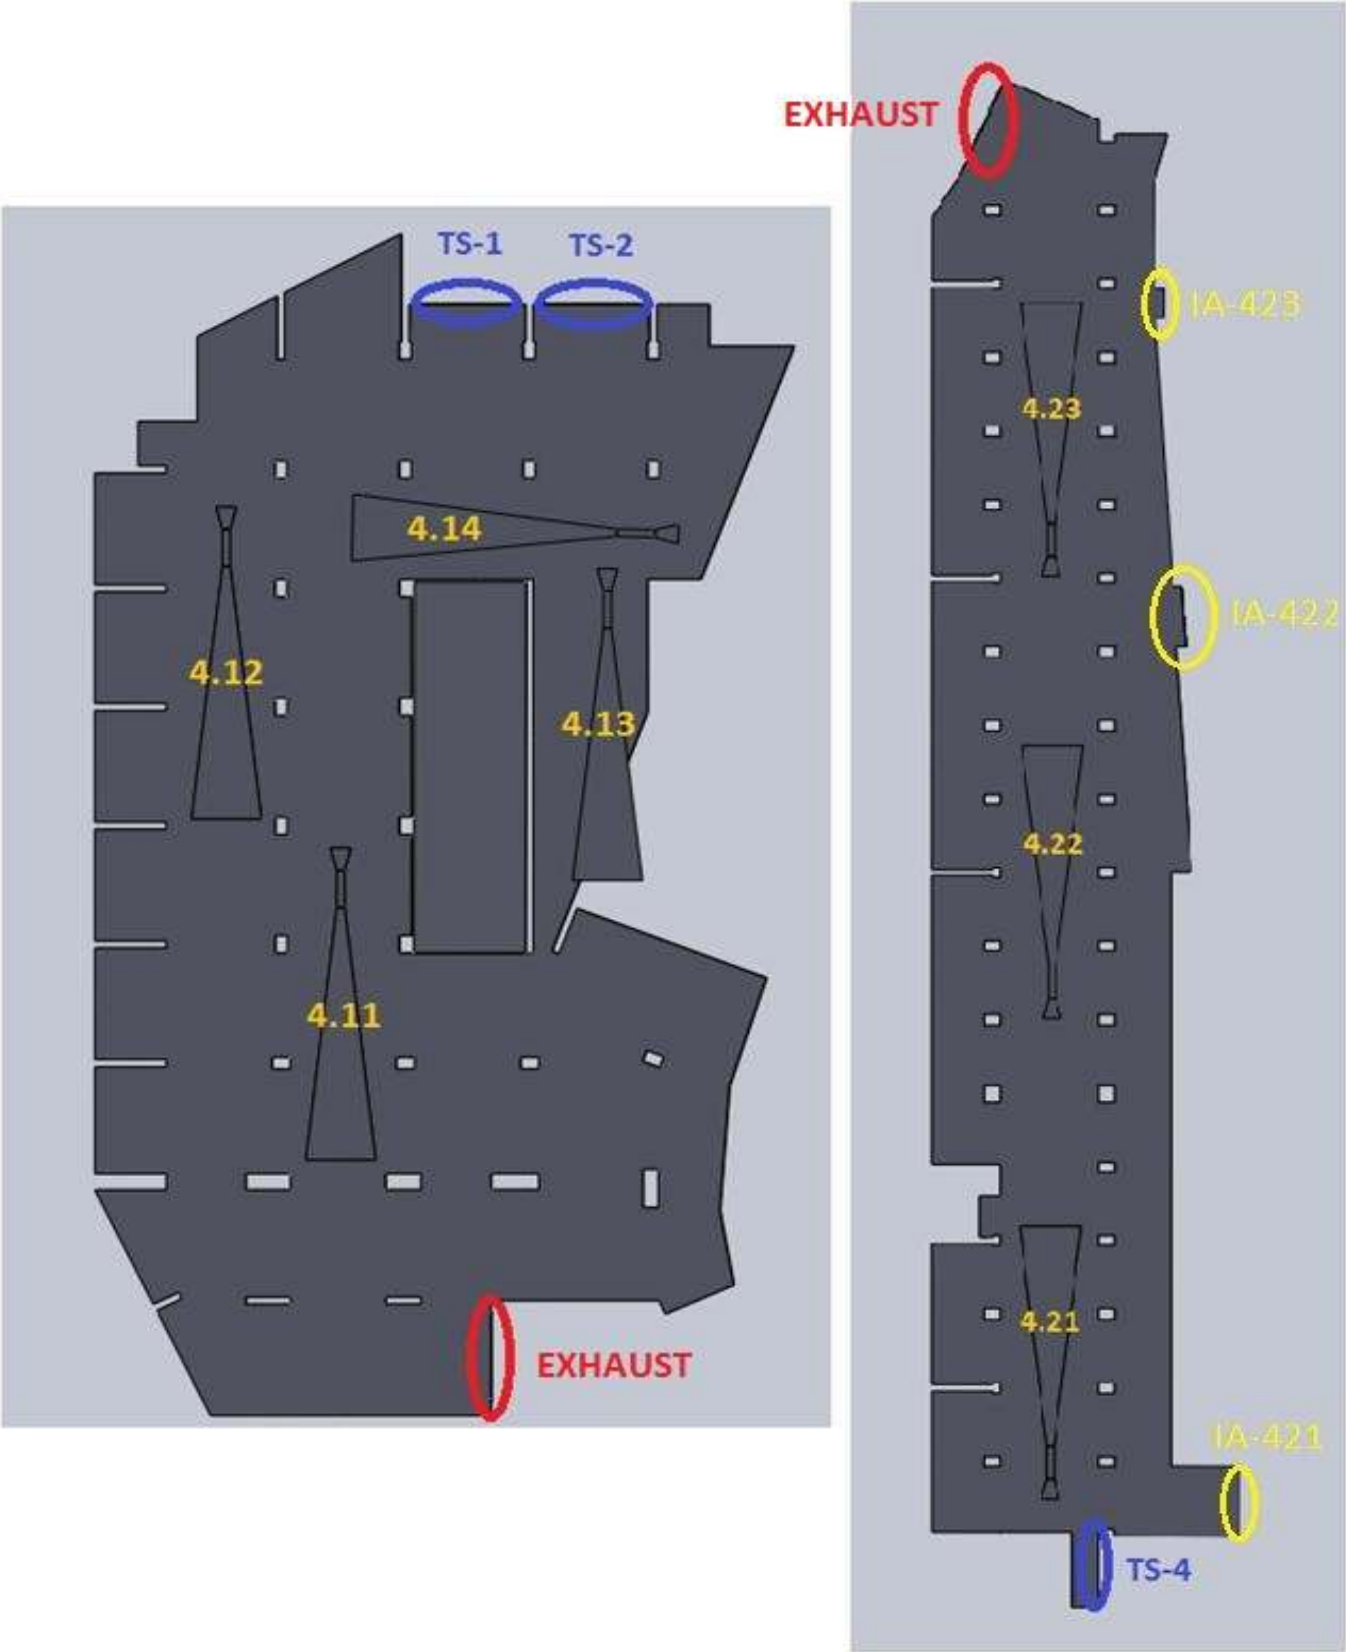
Jet fan layout for PB4 Zone-1 and 2
